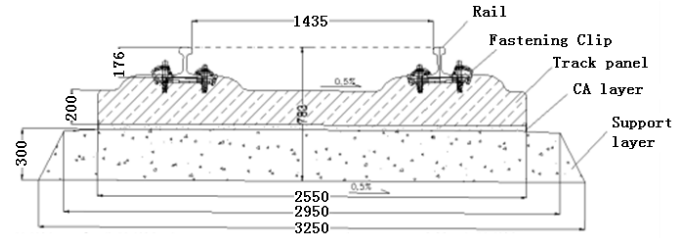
Cross-sectional details of the II type slab track in straight line roadbed section.
